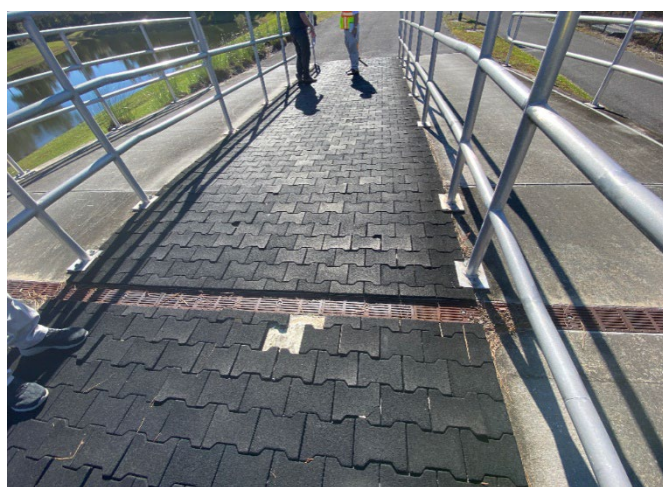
SR 434 Bridge Center Walkway/Equestrian Trail
